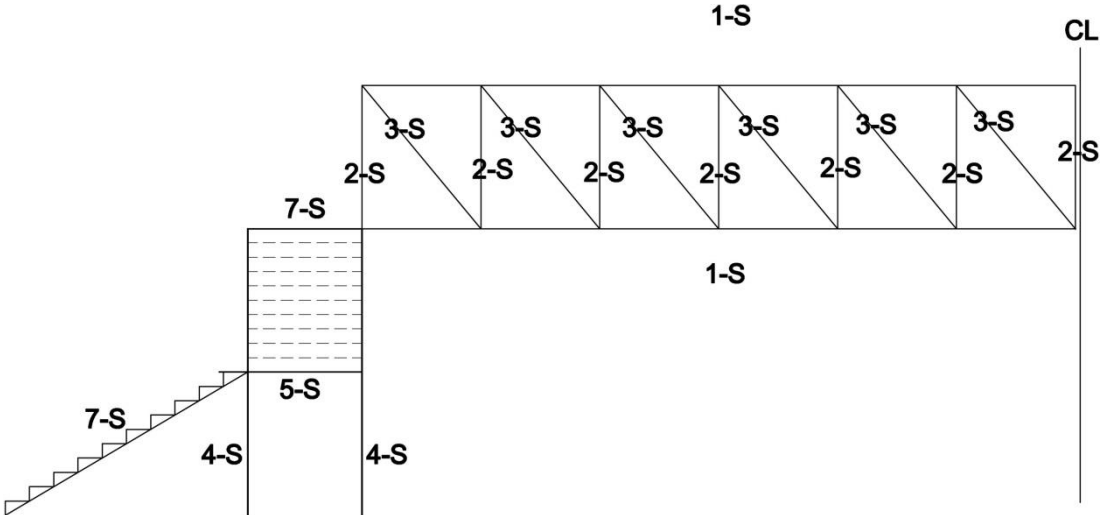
Section ID for elements of single span truss bridge (A5)
